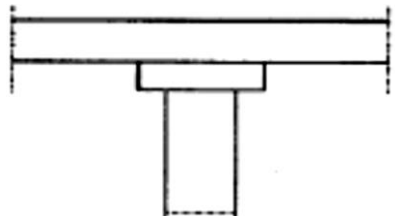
Slab are Supported by Columns Directly without Beams (Sudarno, 2022)
